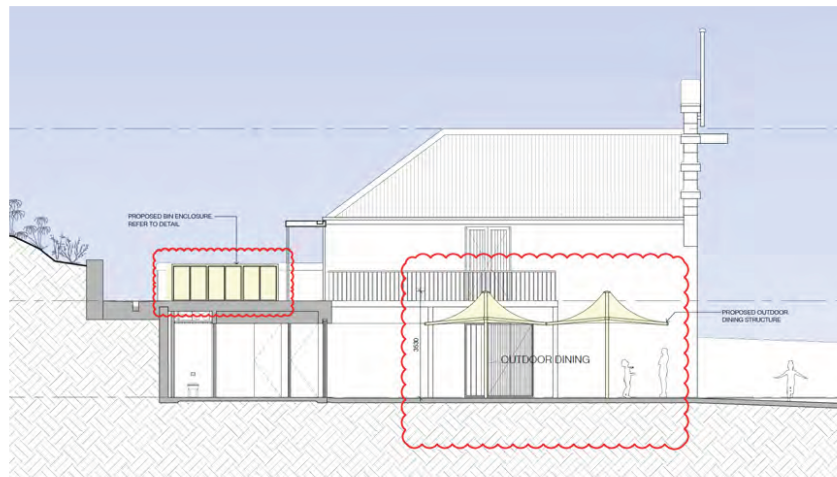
Extract of BJB architects proposal plans, South elevation showing proposed outdoor dining area to the ground floor and proposed bin enclosure to the first floor.
